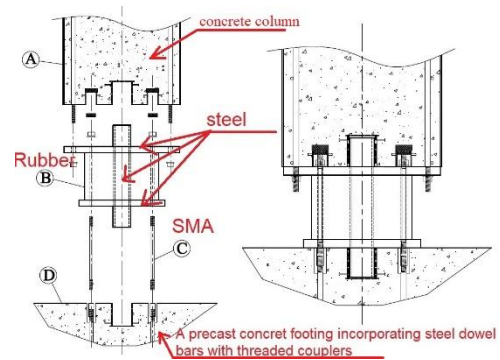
SMA as a fastening tool to link concrete column and footing (Varela, 2016)
